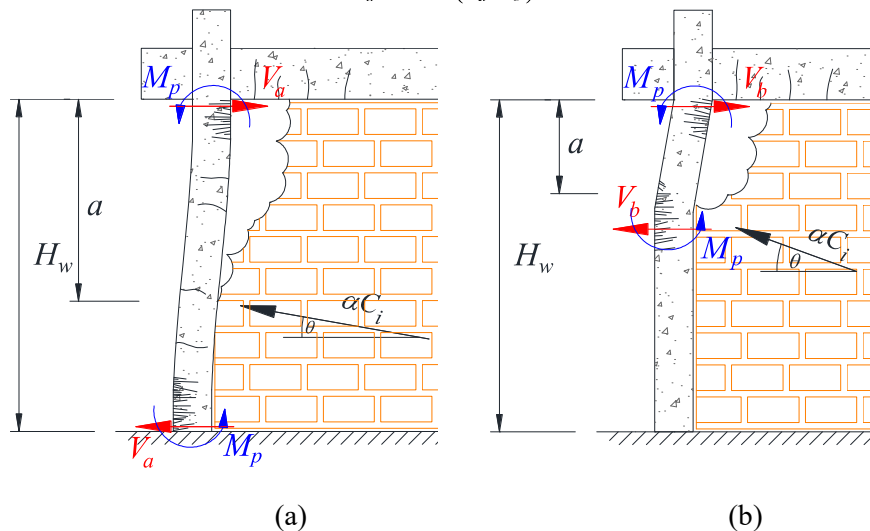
Failure mechanism: (a) Column-Infill Mechanism and (b) Column Mechanism [2]
